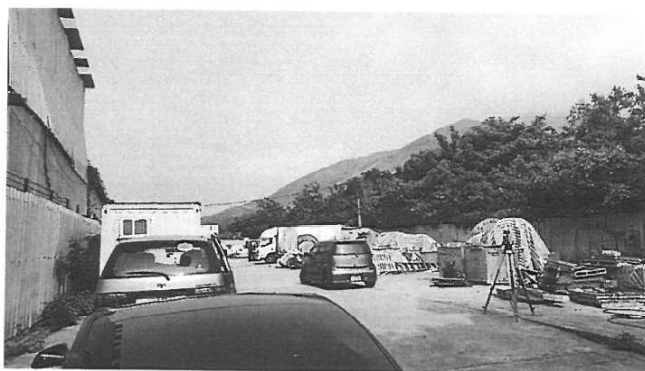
Viewing to the west end of the proposed warehouse site is also fenced-out of another warehouses lot..
